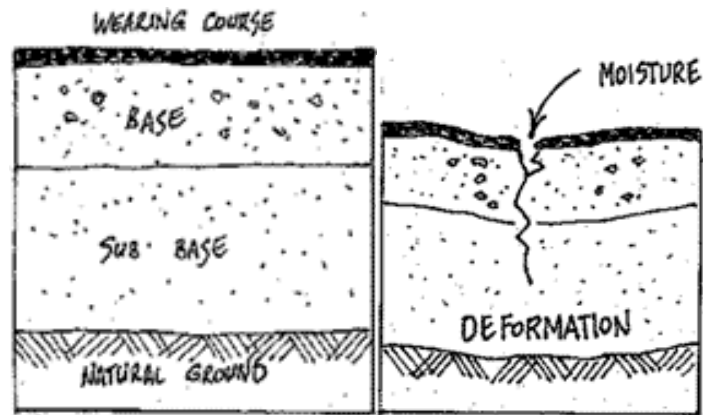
Example of a road pavement in a good condition and poor conditions
